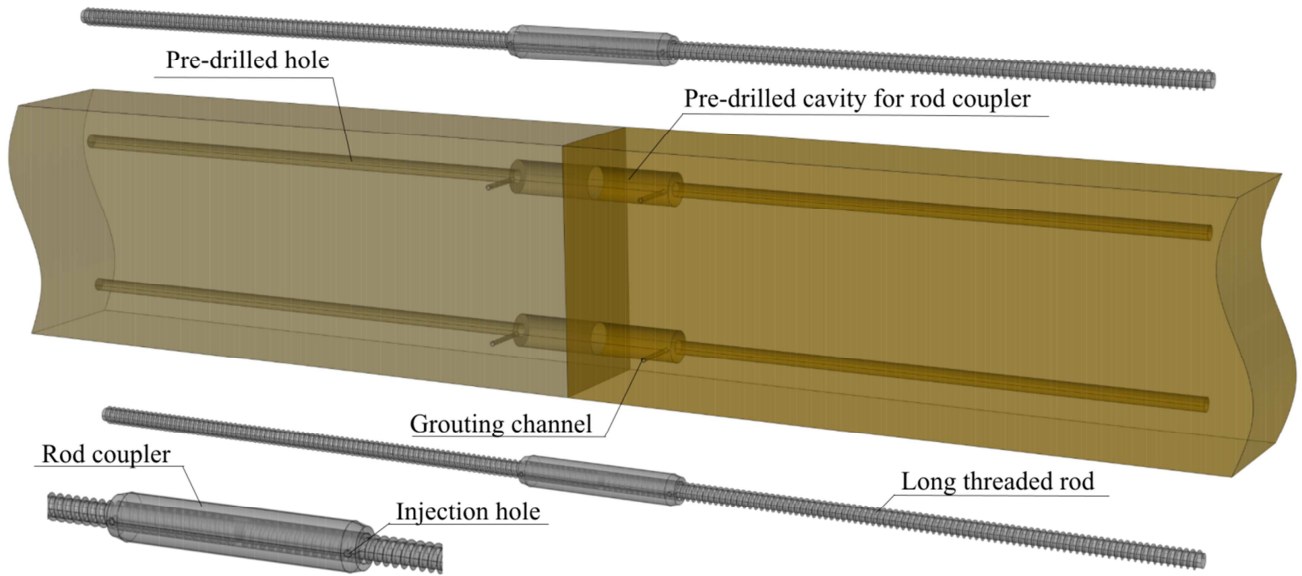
Principal layout of splice connection with long threaded rods and grout-filled couplers.
